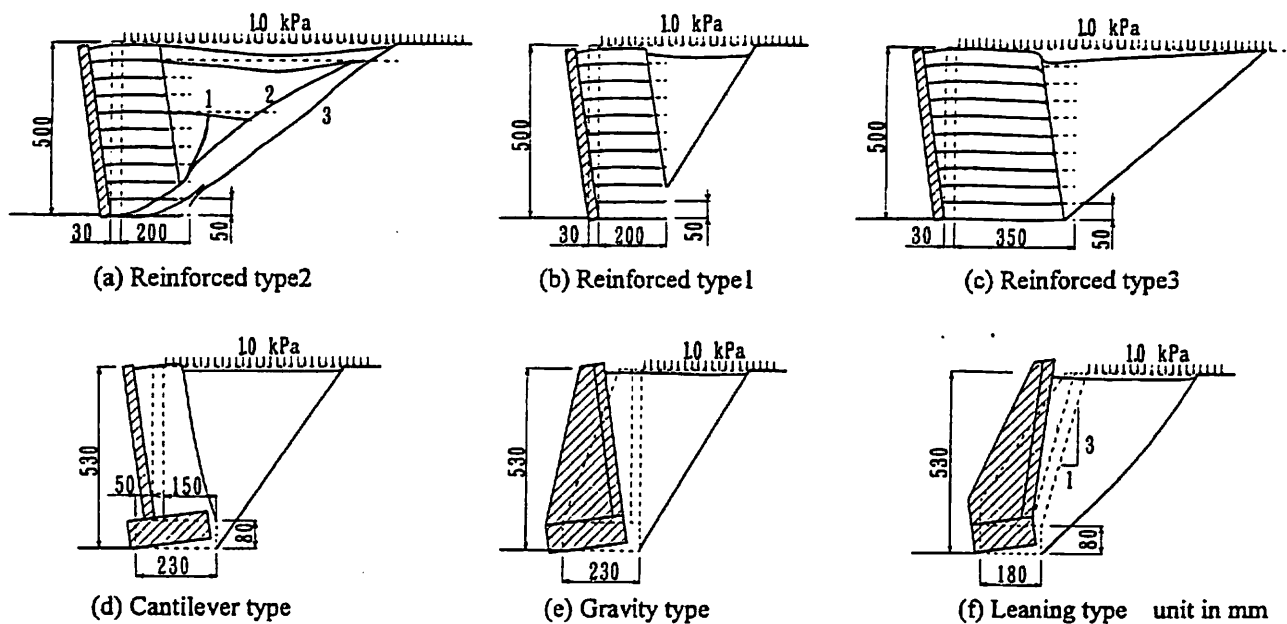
Models of retaining walls showing their initial and displaced locations and observed failure planes; a) GRS-RW having a couple of extended top reinforcement layers, denoted as “Reinforced type 2” in Figs 4.8 and 6.2; b) GRS-RW having short reinforcement layers, denoted as “Reinforced type 1”; c) GRS-RW having moderately long reinforcement layers, denoted as “Reinforced type 3”; d) cantilever-type RW; e) gravity-type RW; and f) leaning-type RW (Koseki et al., 1997).
